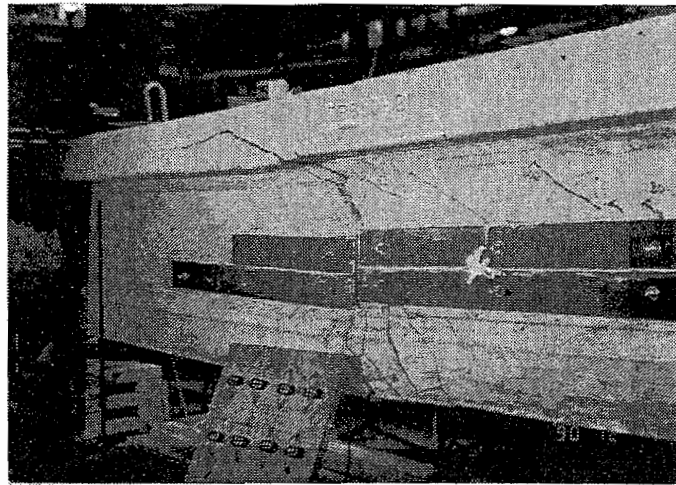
Web Shear Cracking and Bond Failure DB850-1B
